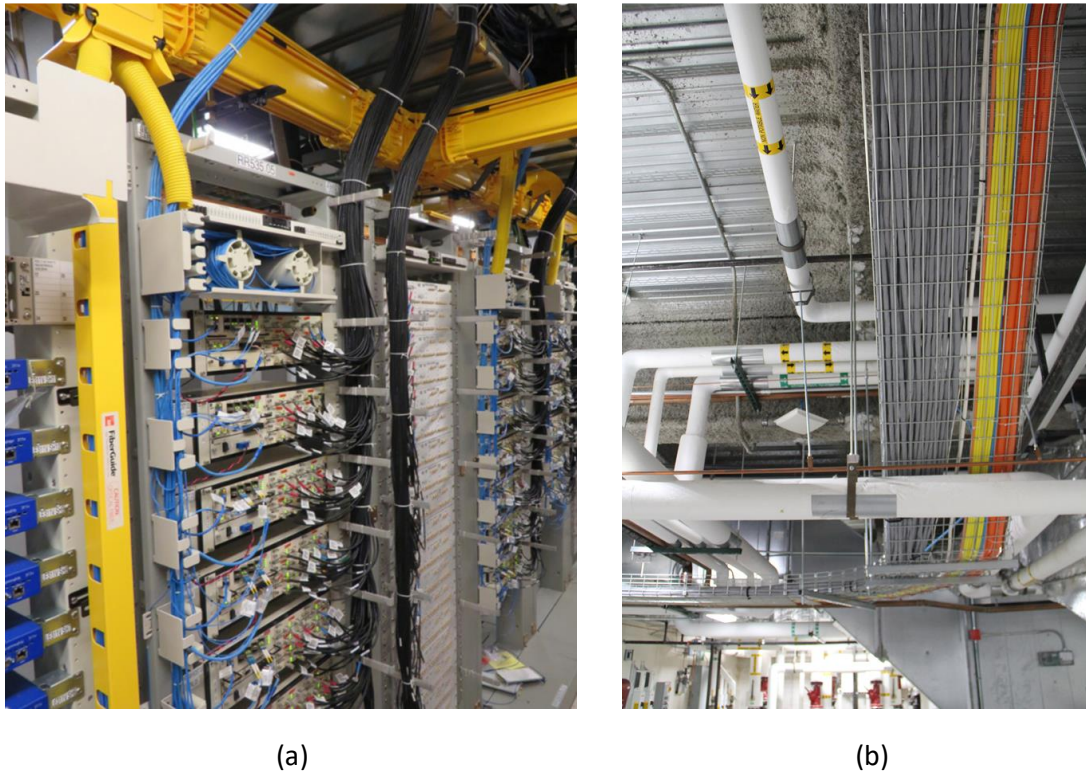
Cabling of a Commscope® DAS: (a) central hub; (b) inbuilding cabling [58]
